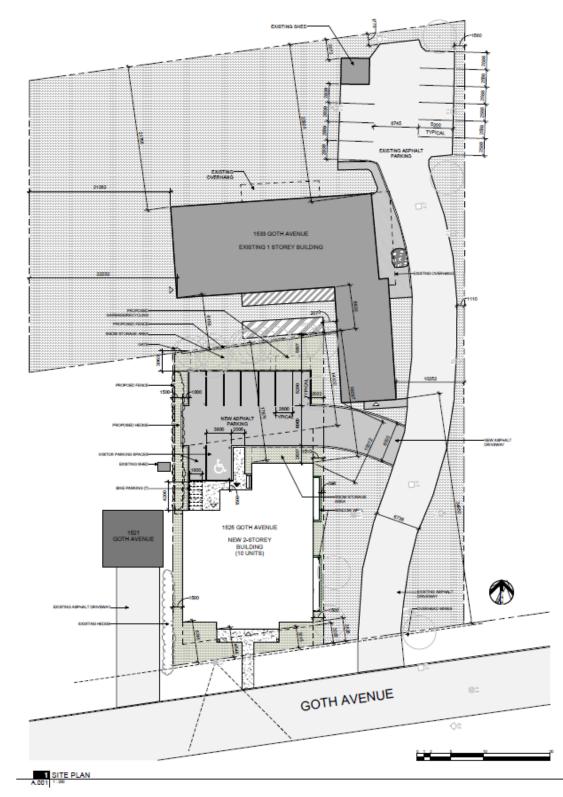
1525 Goth Avenue - Site Plan (Excerpt) (CSV Architects, June 10, 2022)
